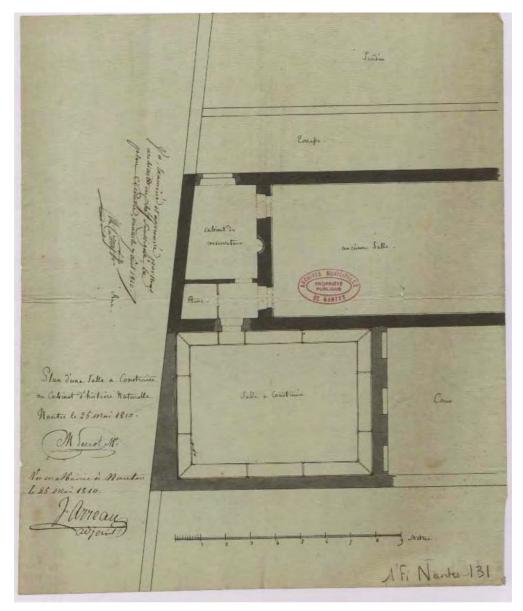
Architectural plan of a new room at the Nantes museum, 1810. AMN
